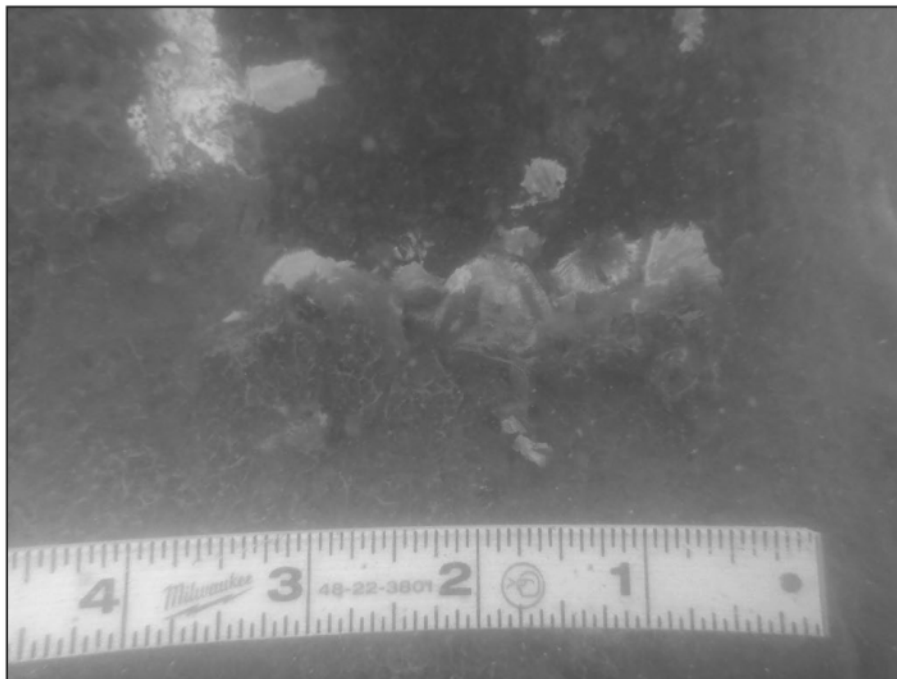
Typical Underwater Condition of Vintage Timber Sheeting
